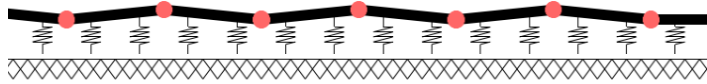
Typical longitudinal structural system of an immersed tunnel -
